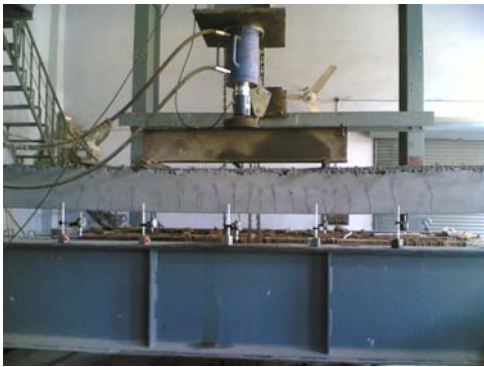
Crack Patterns in Balanced Beams Retrofitted with Ferrocement Jackets Reinforced with Three Layers of GI Woven Wire Mesh and Stressed to 60% Level
